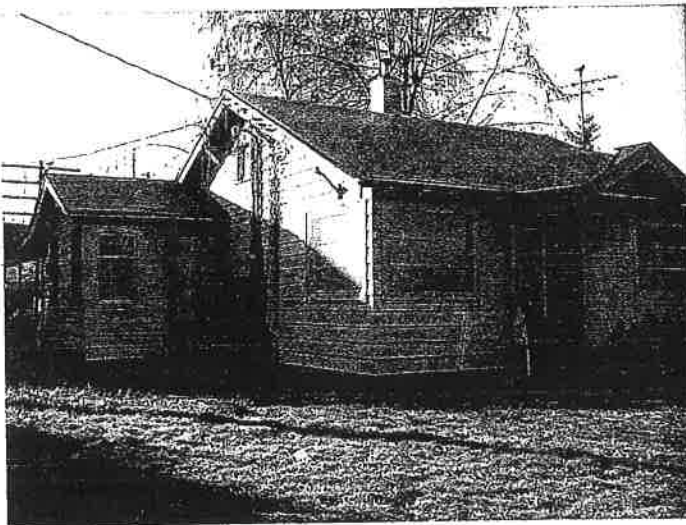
Southern house on subject property. Wood window, door, and other trim painted with a lead containing finish. Siding is aluminum. Lead not detected on siding finish.
